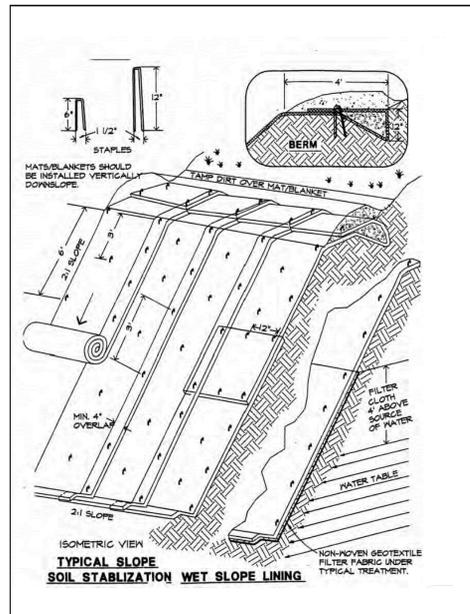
Erosion Blankets and Turf Reinforcement Mats – Slope Installation
